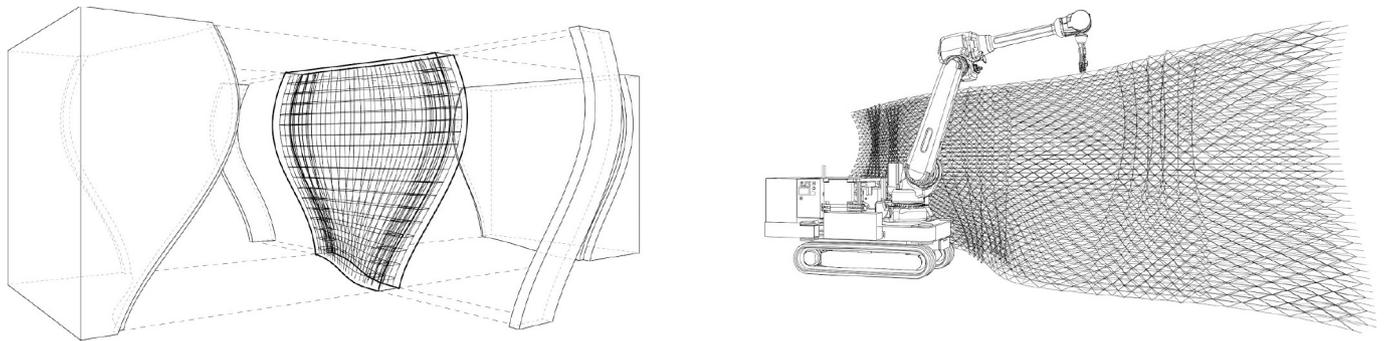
(left) Illustration of the standard way to produce doubly-curved steel-reinforced concrete walls using formwork and rebar cages. (right) Illustration of the concept behind the mesh mould, in which an in situ fabricator builds a dense reinforcement mesh directly on site. The mesh serves as a lost formwork.
